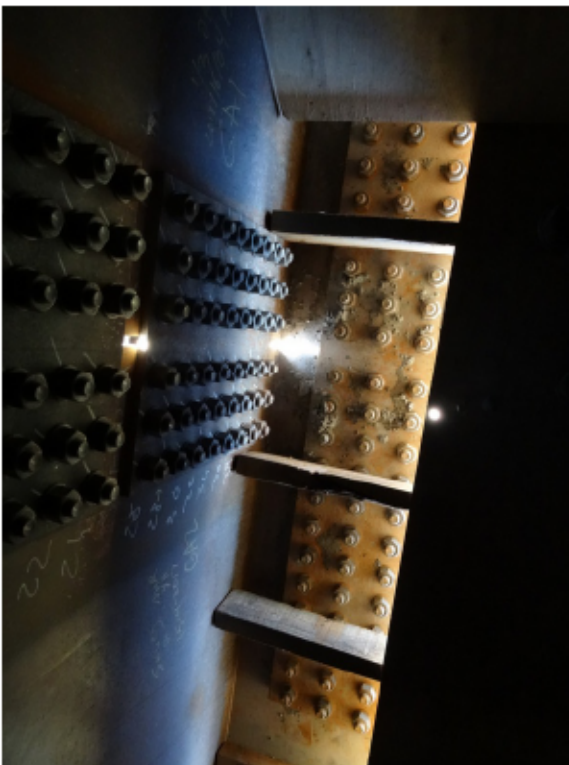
Typical girder splice bottom (NW first splice, west girder)
